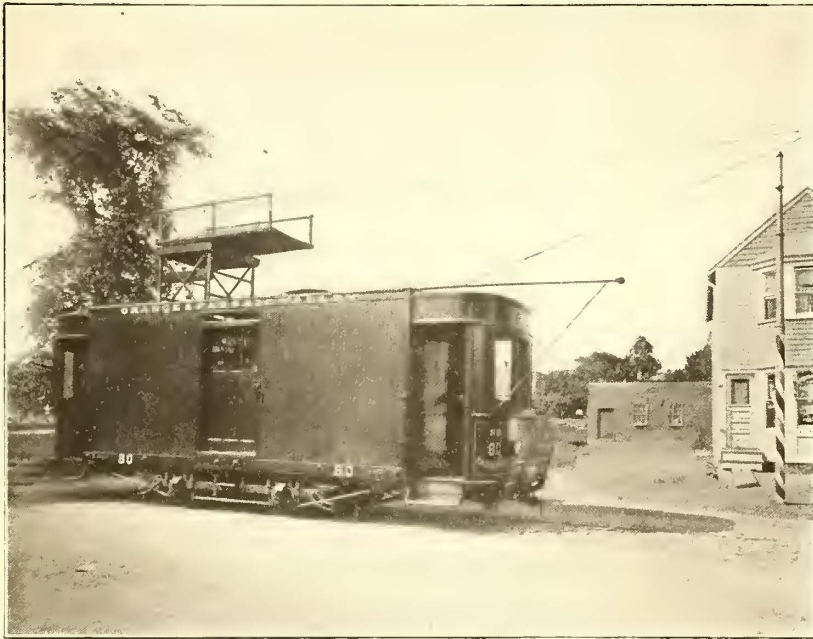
STRINGING LIVE TROLLEY WIRE
